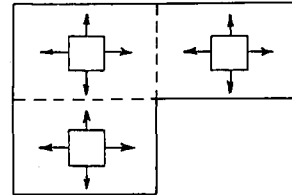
Mount the unit on the ceiling at the center of area to be cleaned.
